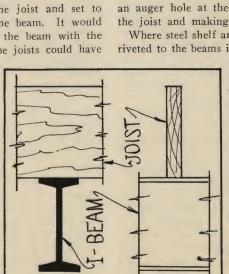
Wood Joist Resting on Steel Beam. In this case the beam is an intermediate support.
